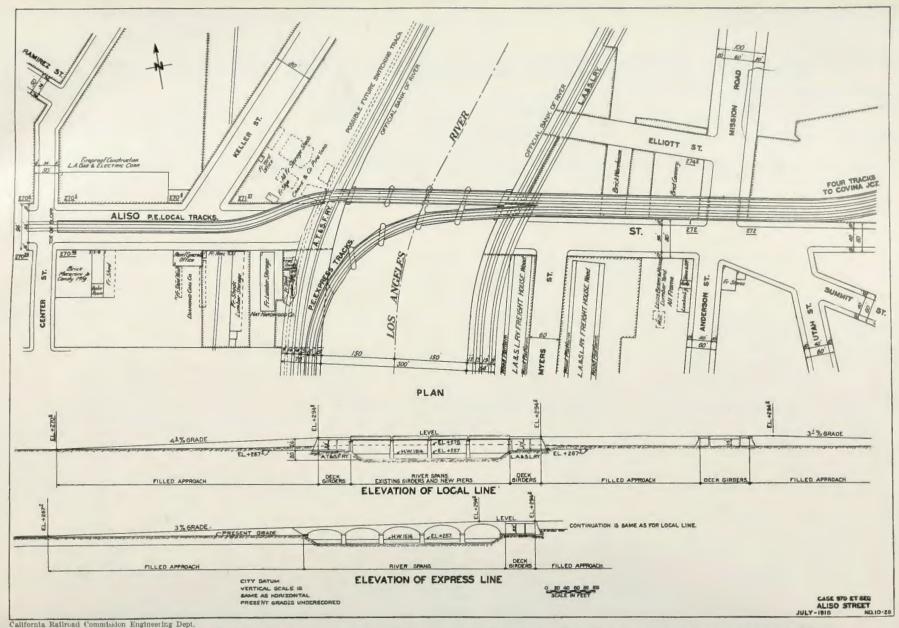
PLAN AND ELEVATION FOR AN INTERURBAN ELECTRIC RAILWAY BRIDGE ACROSS THE LOS ANGELES RIVER AT ALISO STREET
